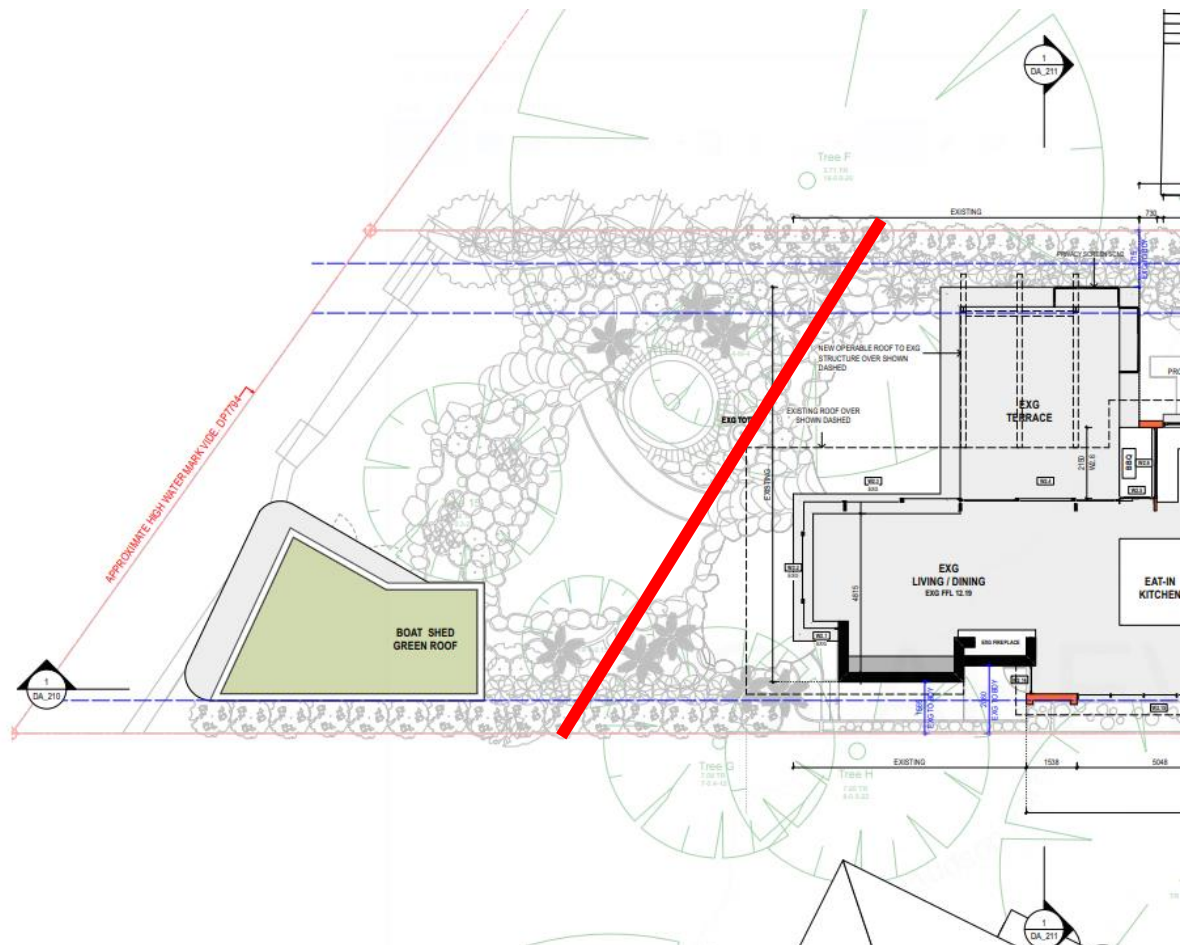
Plan extract showing foreshore building line (in red) relative to built form structures
